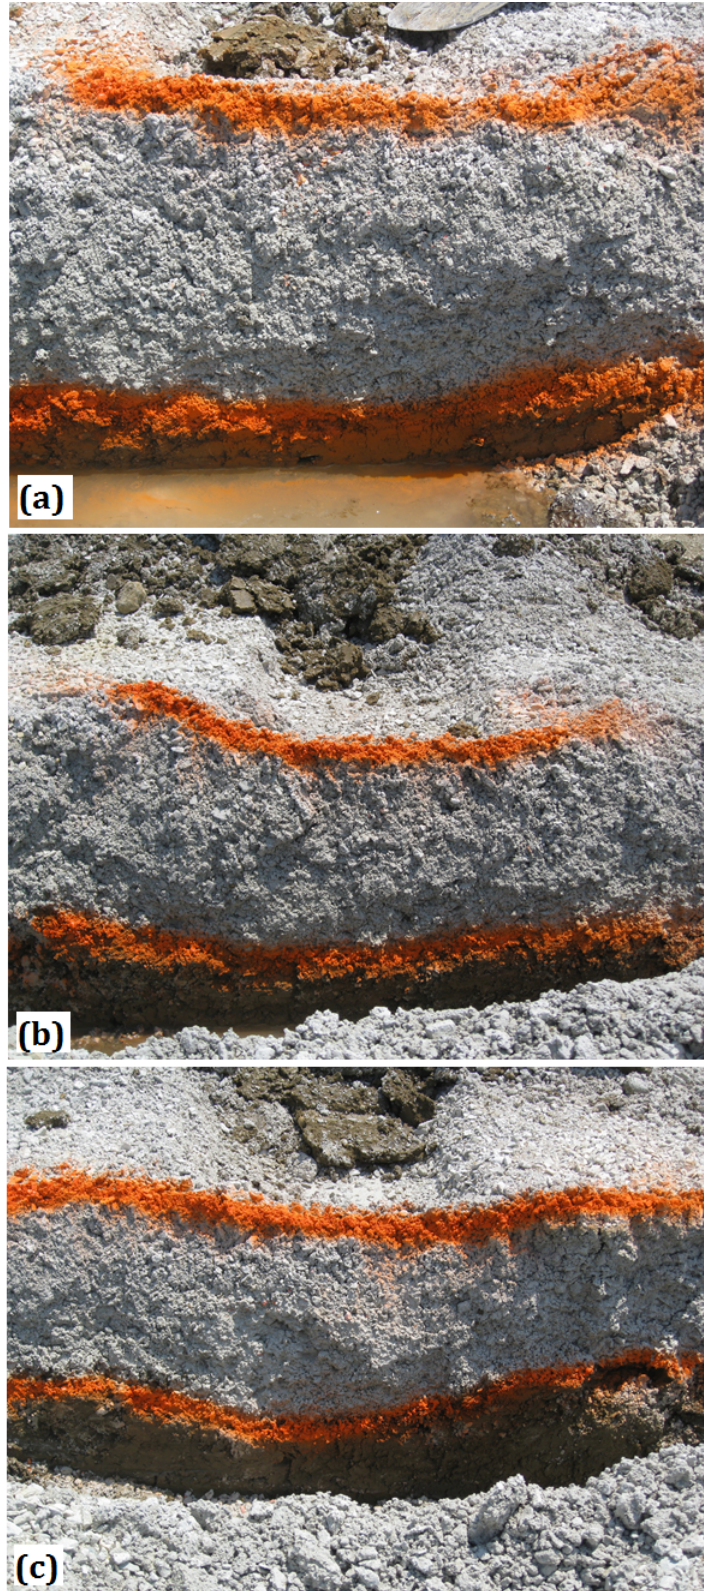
Excavated Trench Photos Showing Surface and Base-Subgrade Interface Deformations in Test Sections (a) 1, (b) 2, and (c) 3 due to Loading of Cell 3 under Flooded Conditions
